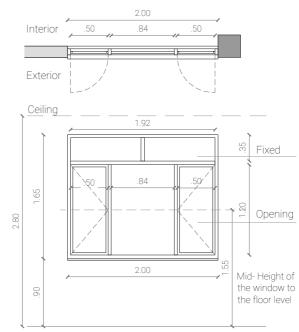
Window W1plan and facade _Scale 1:50/Source: Author's elaboration
